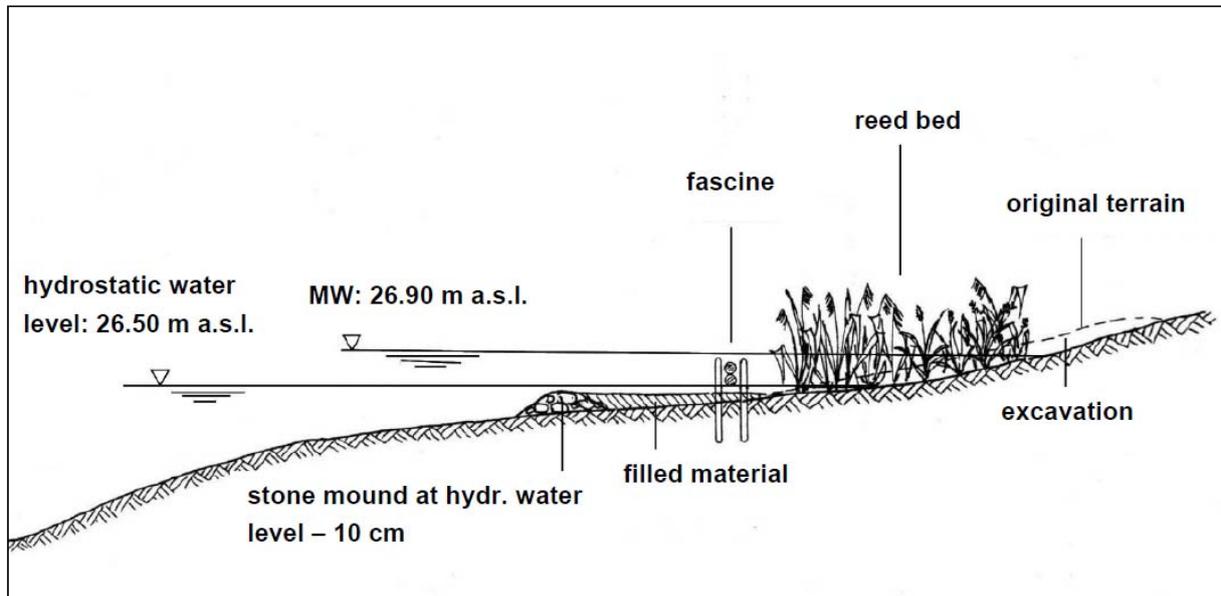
Reconstruction of the bank by installation of a stone mound and flattening of the bank: the profile of Section 1 (from the plans; later a stone mound was constructed here at hydrostatic water level + 20 cm).
